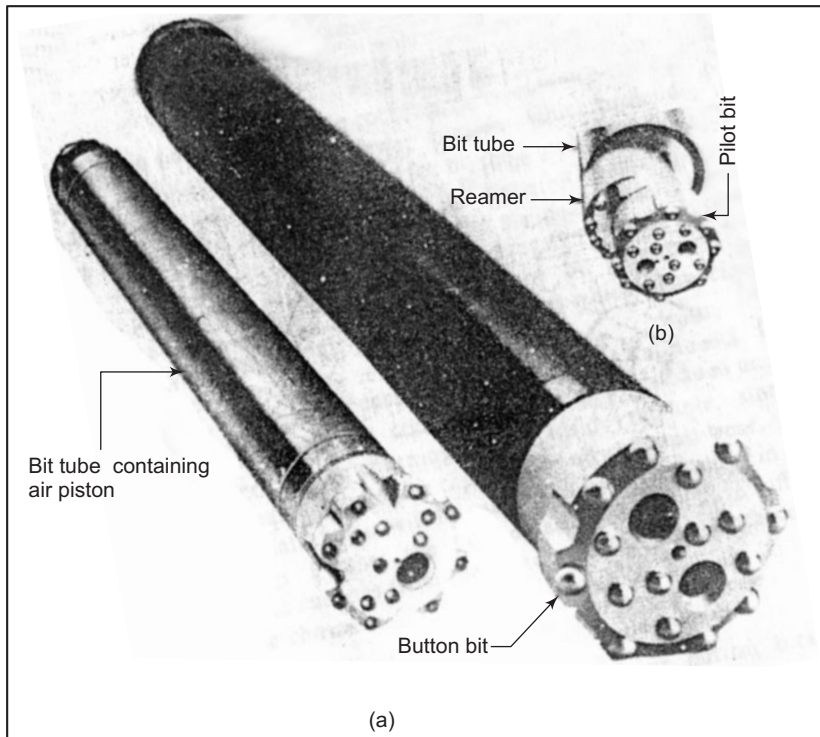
Drill hammers containing pneumatic pistons equipped with button bits: (a) Regular, (b) ODEX type
